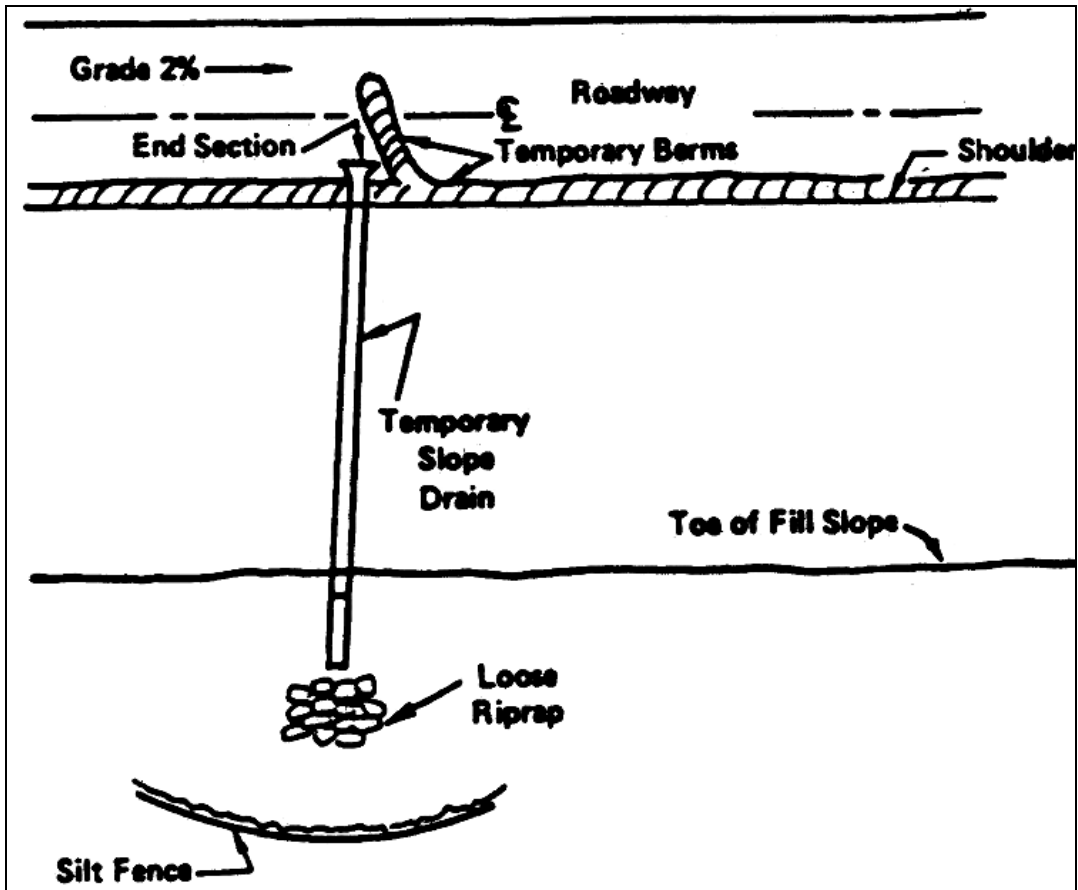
Temporary berm and temporary slope drain system (Source: Department of Civil, Construction, and Environmental Engineering, Iowa State University)
